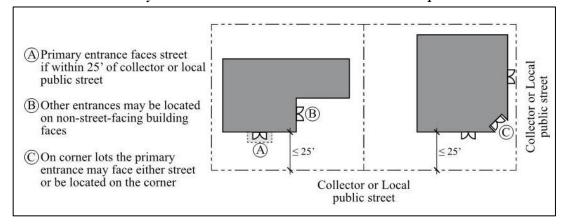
Maximum Building Setback - Street Orientation Option
